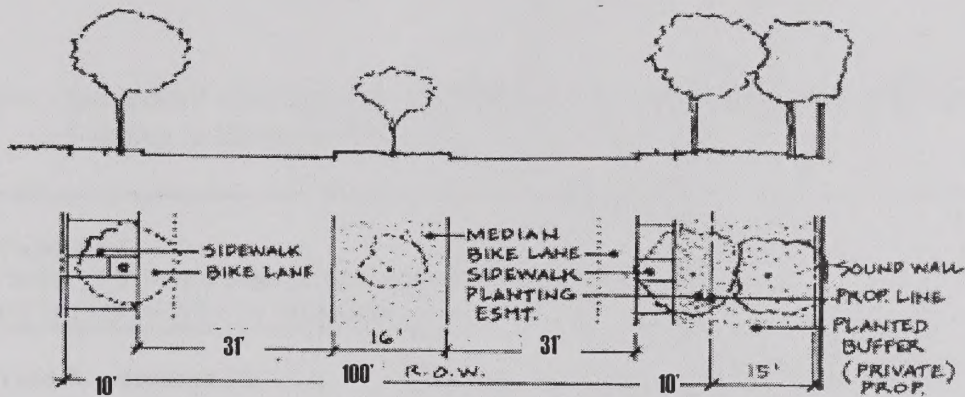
Street Section. Countryside Drive between Monte Vista Avenue and Tuolumne Road
